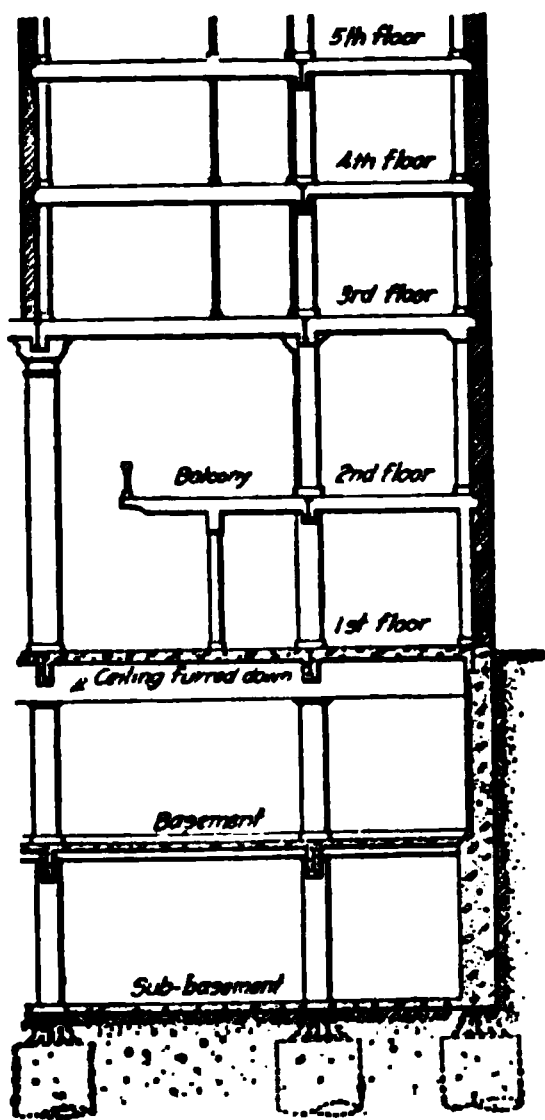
Showing method of avoiding offset columns and resulting heavy girders by using unequal panel lengths.
